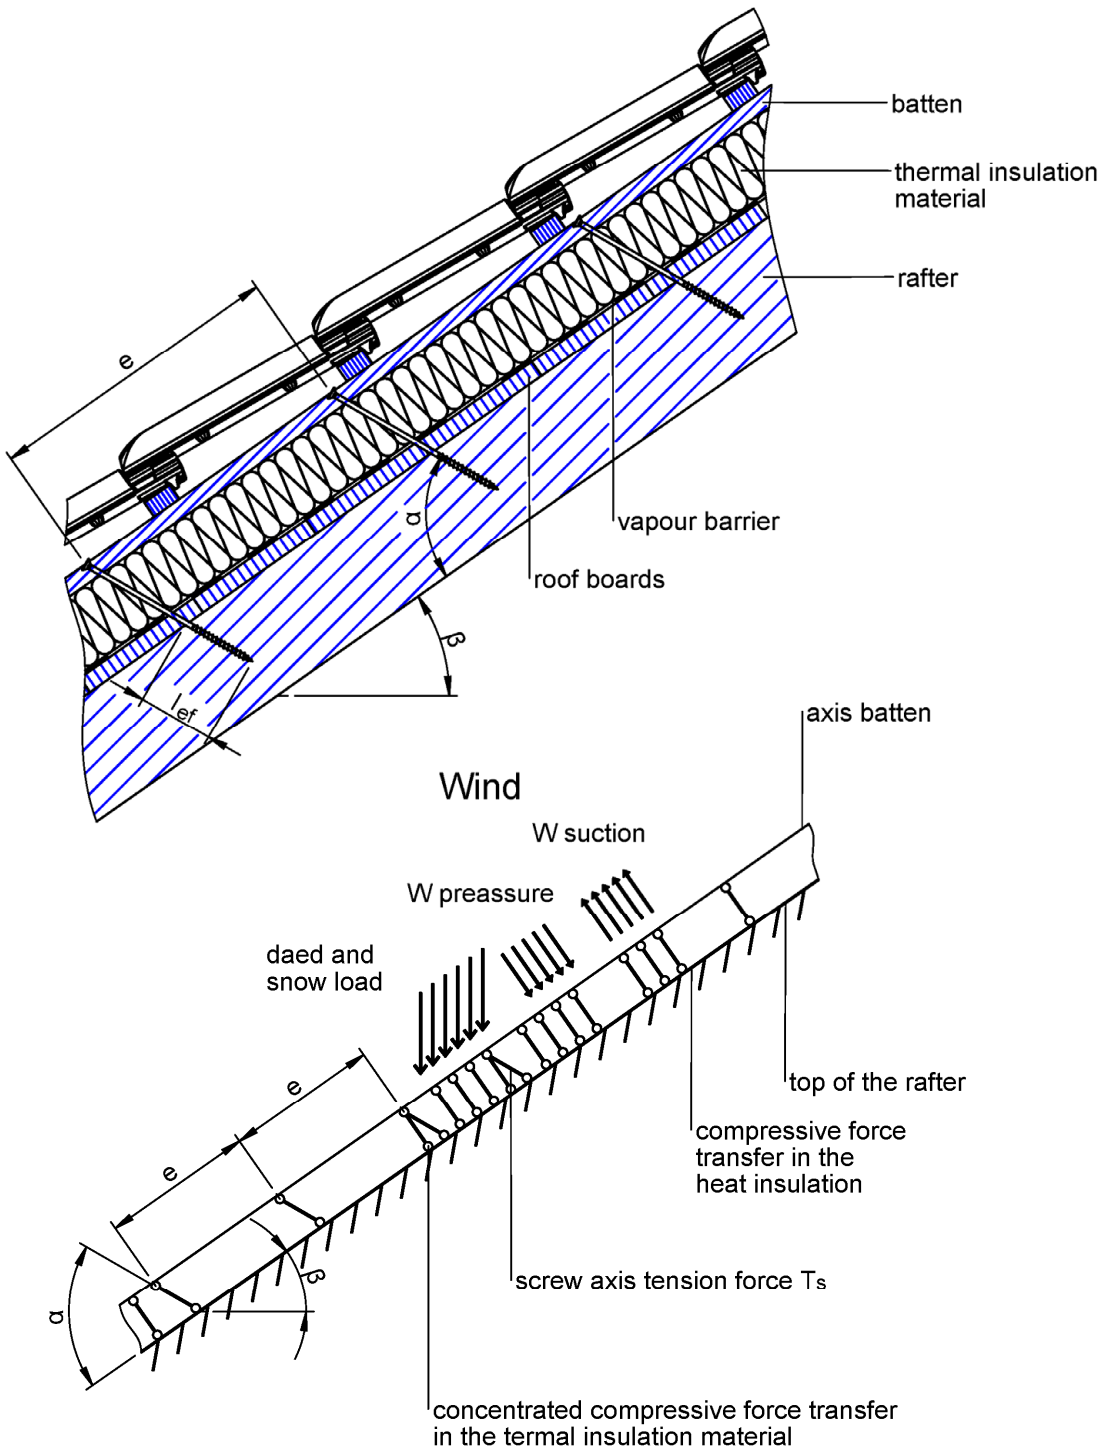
Fastening of the thermal insulation material on top of rafters - structural system
